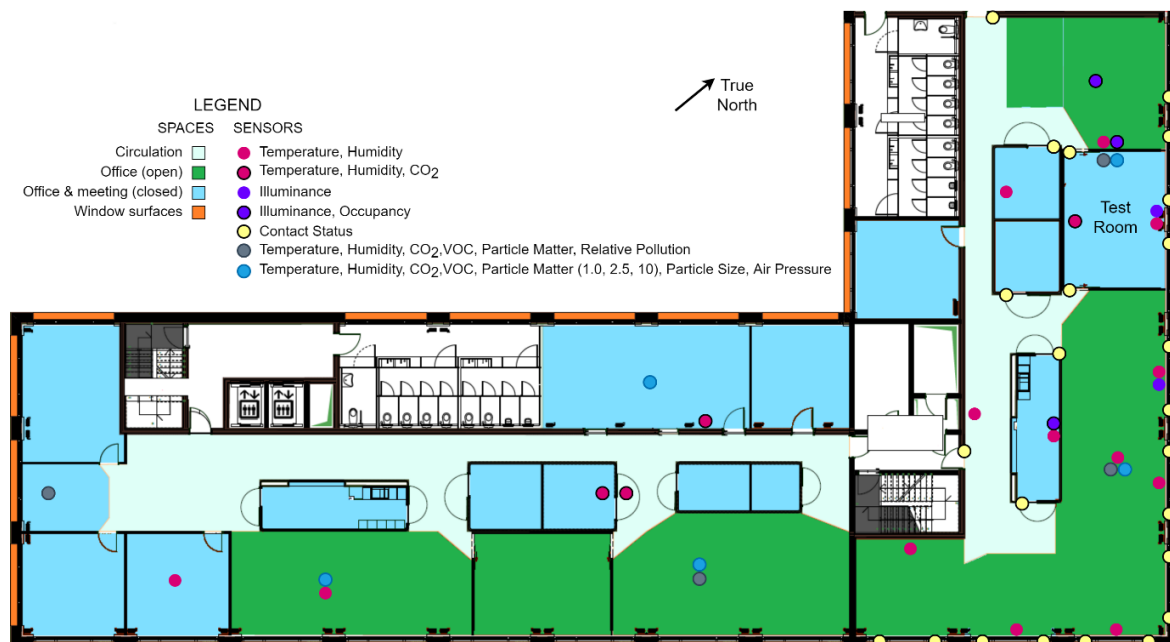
Floor plan of pilot building with deployed sensors and spatial layout
